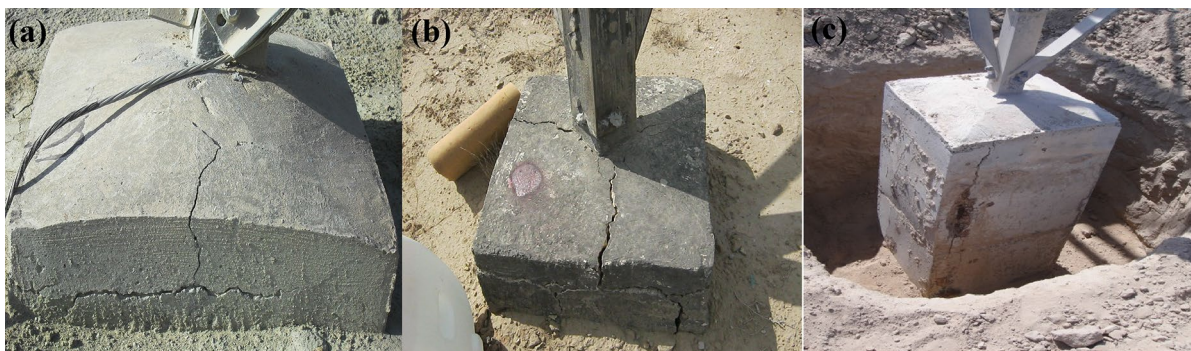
Corrosion-affected zones of electric transmission tower foundations.
